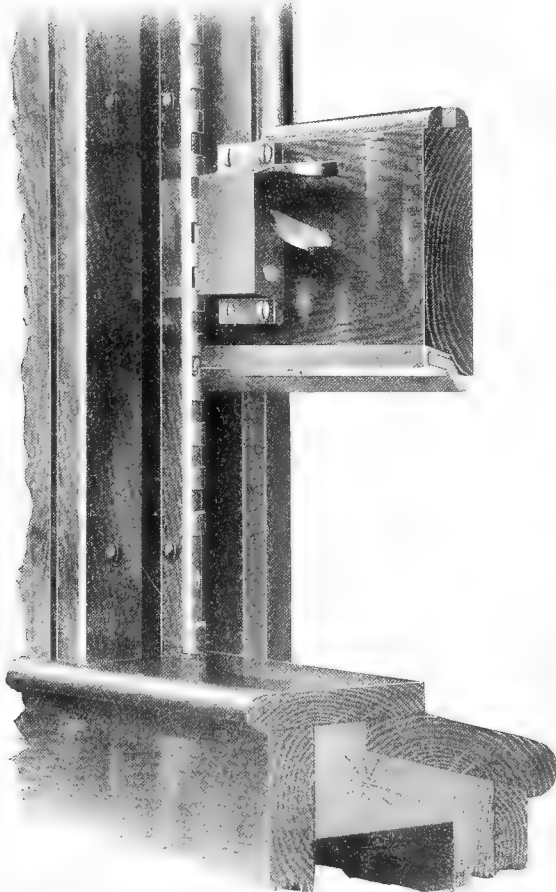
Universal Bottom Weather Stripping and No. 20 Wedging Sash Lock and Rack.
